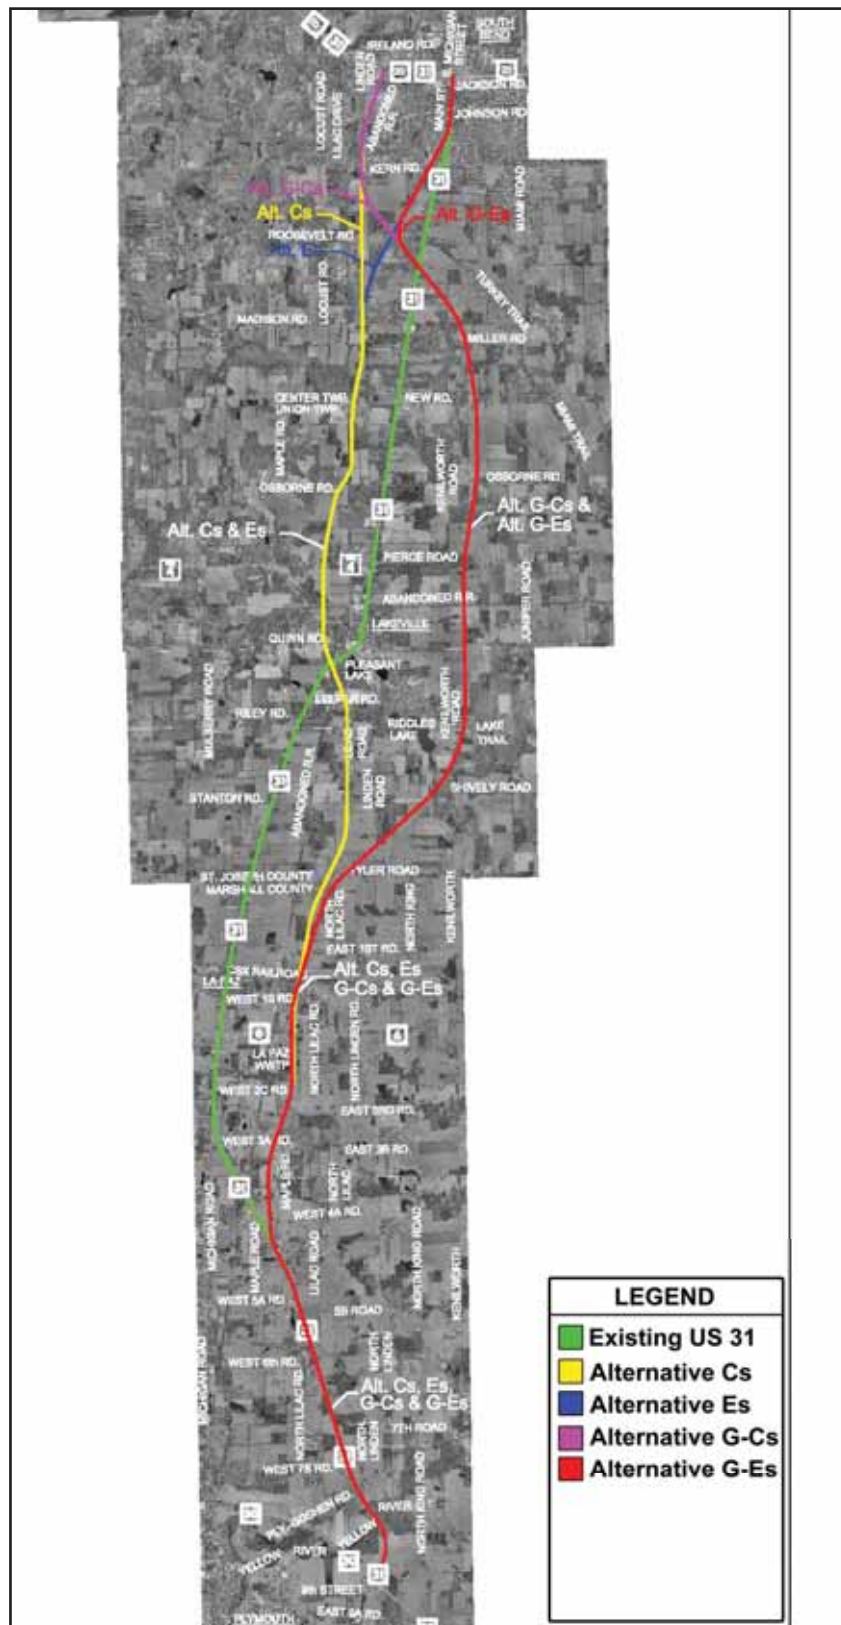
Preliminary Alternatives Studied in Detail – Alternatives Cs, Es, G-Cs and G-Es
